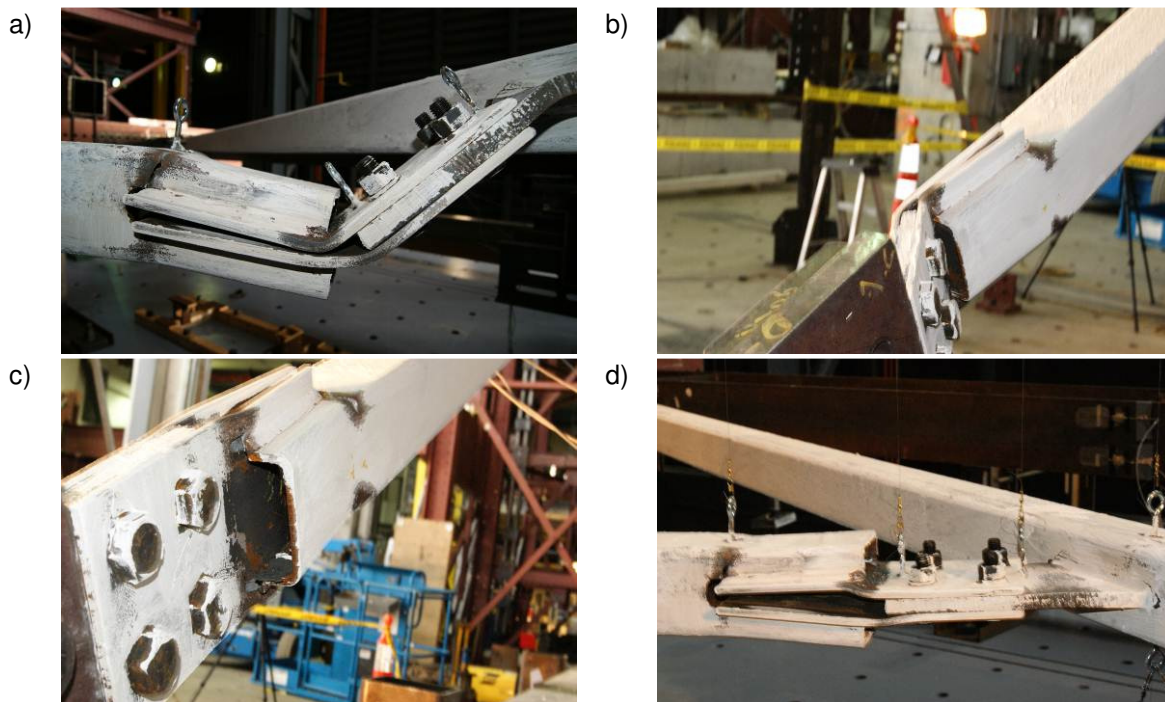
Damage to connections after buckling in HSS X-bracing with DS connections without shim plates (Specimen no.13).
